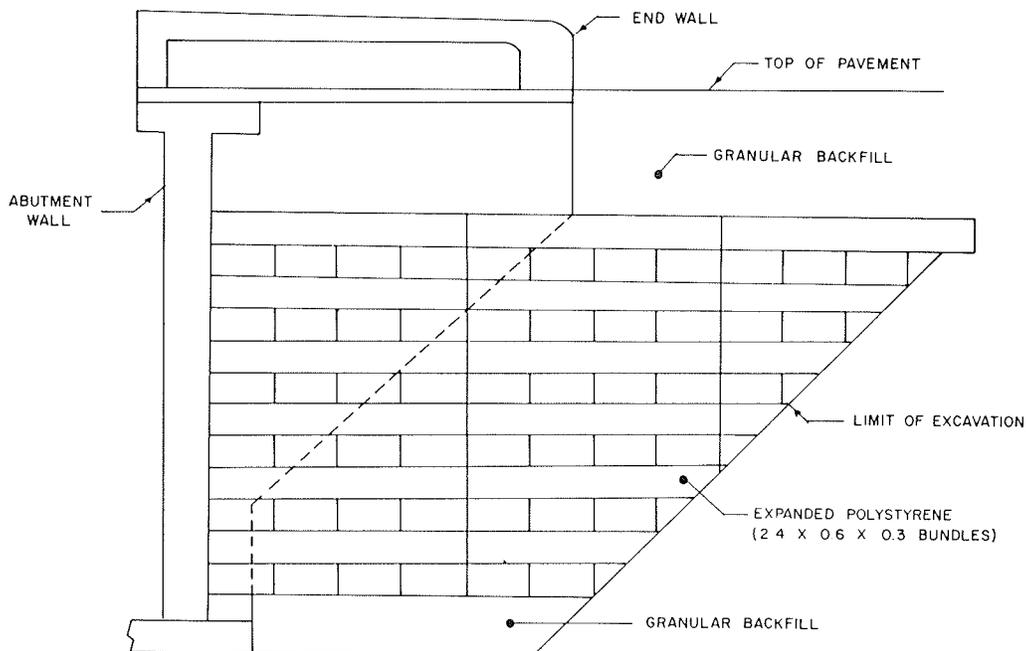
Use of expanded polystyrene as lightweight fill at structure.
